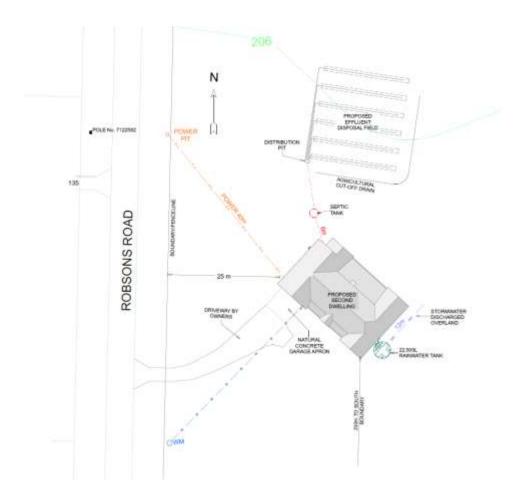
Extract of Site Plan of Proposed Second Dwelling
